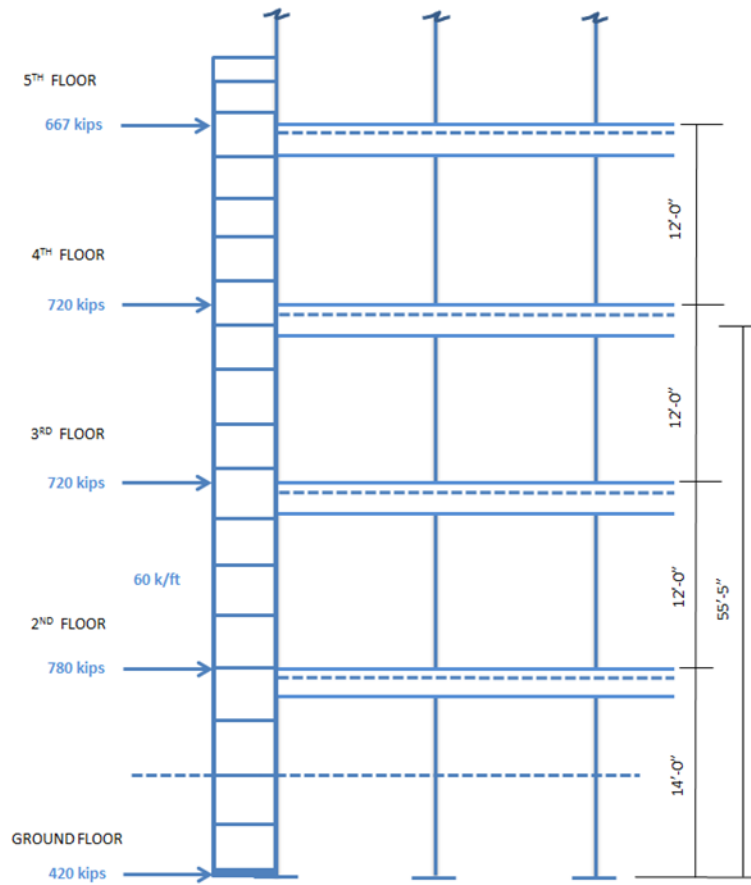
LC3 Tsunami loads on overall Hilo office building
